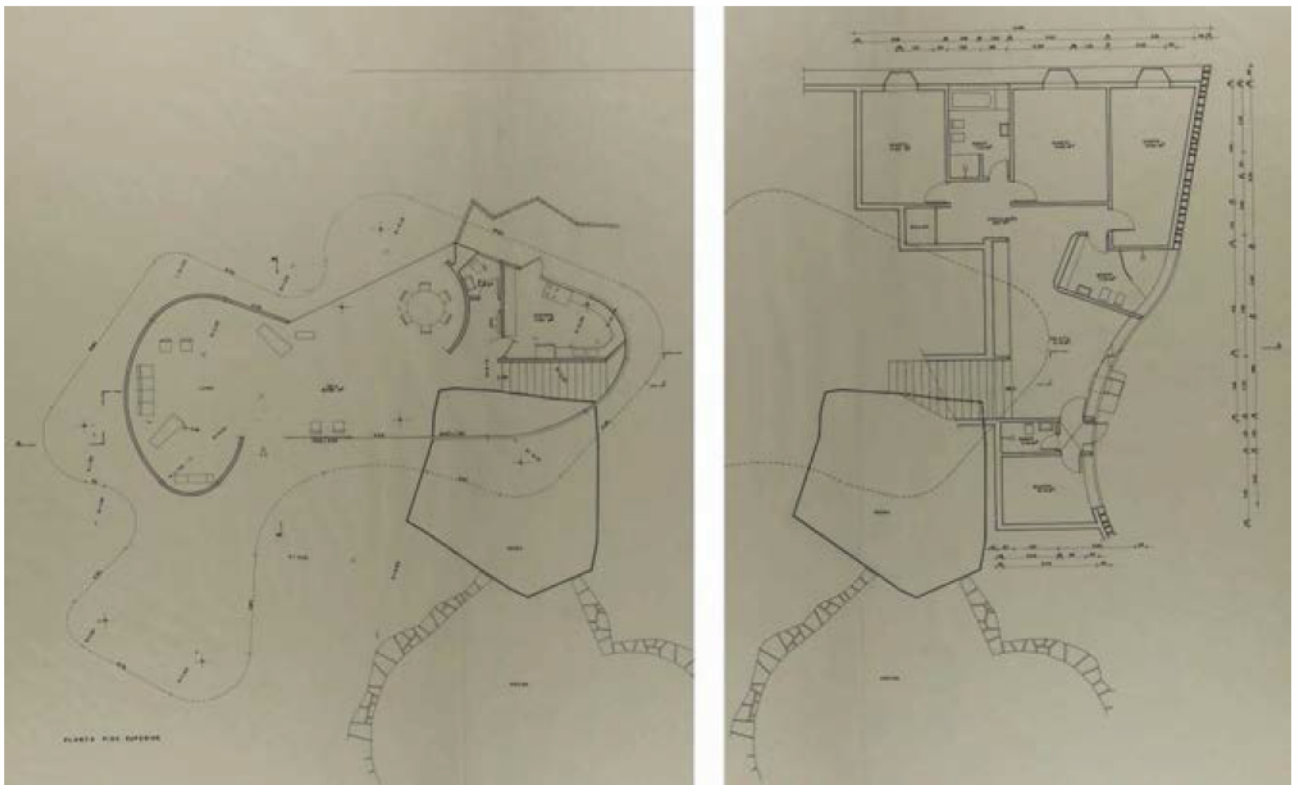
Niemeyer's original drawings for "Casa das Canoas" (1950) digitalized by Oscar Niemeyer Foundation, on the left ground floor and on the right the basement plan (same scale).
